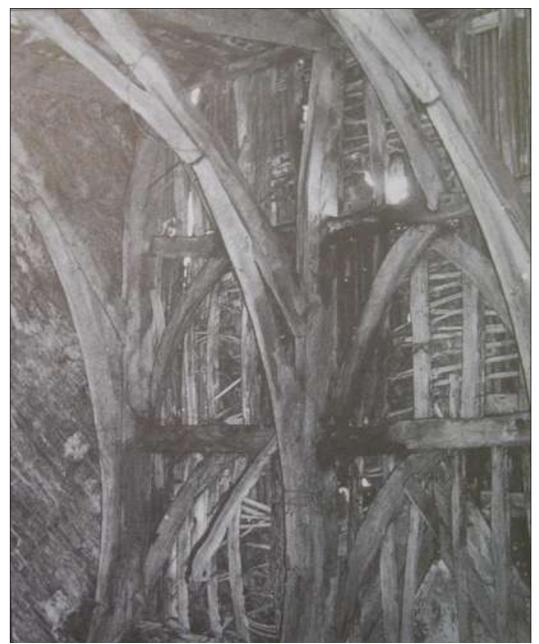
The original roof of the Great Barn, the western truss-blades at the southern end, viewed from below and to the north-east. This photo was published in Langdon (1995), and shows the 15th century arch-braced roof was in a poor state of repair by the early-mid 20th century.
